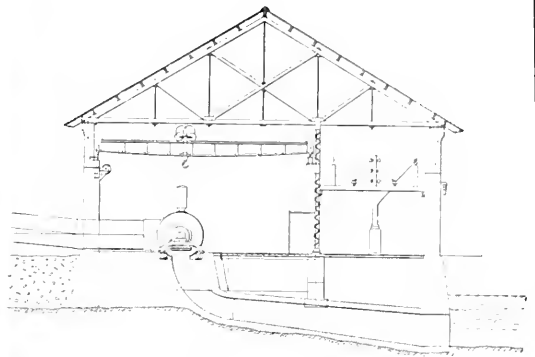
CROSS-SECTION OF POWER HOUSE.
